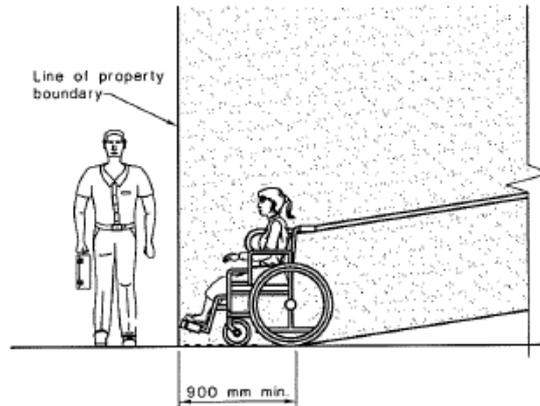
(A) RAMP HANDRAILS—EXAMPLES OF HANDRAIL TERMINATIONS
